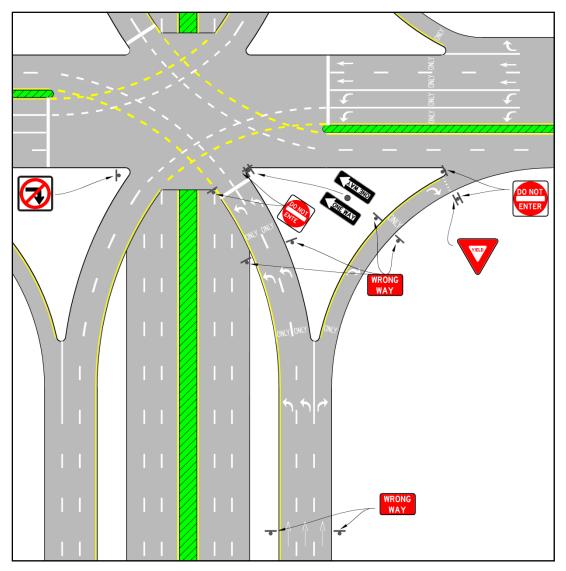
Example of signage and pavement markings at an exit ramp of an SPDI.
